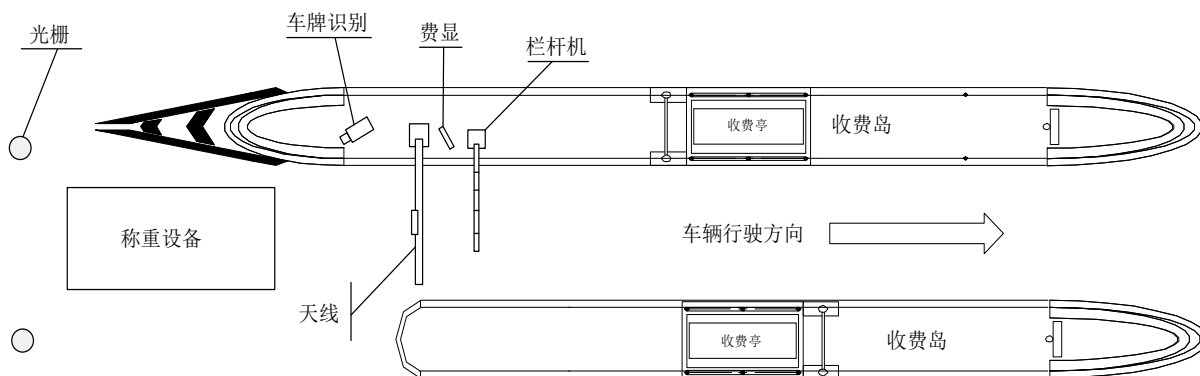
Front layout plan of the single antenna rail for the truck ETC driveway
